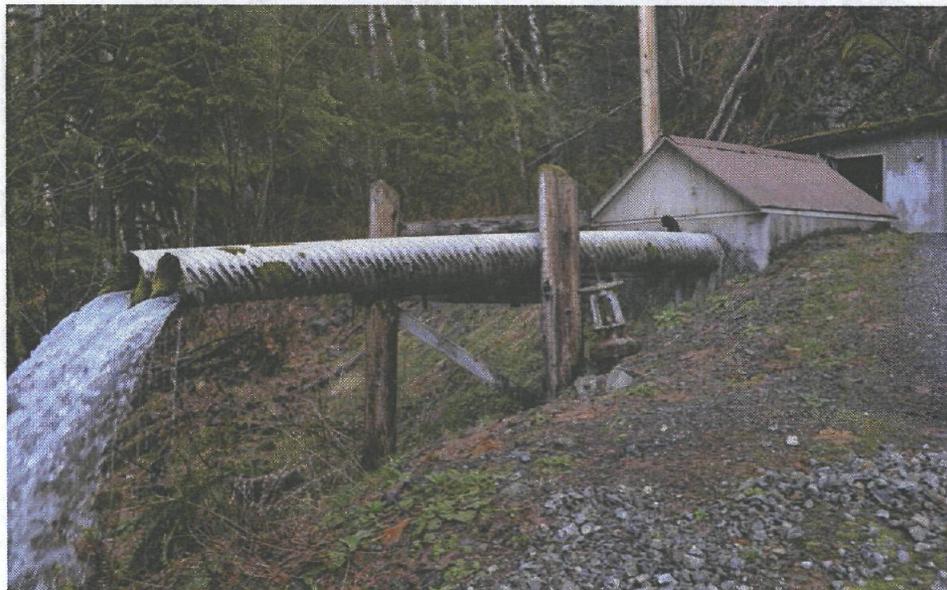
The overflow structure and pumphouse (top right). Excess water cascades to Sulphur Creek.
